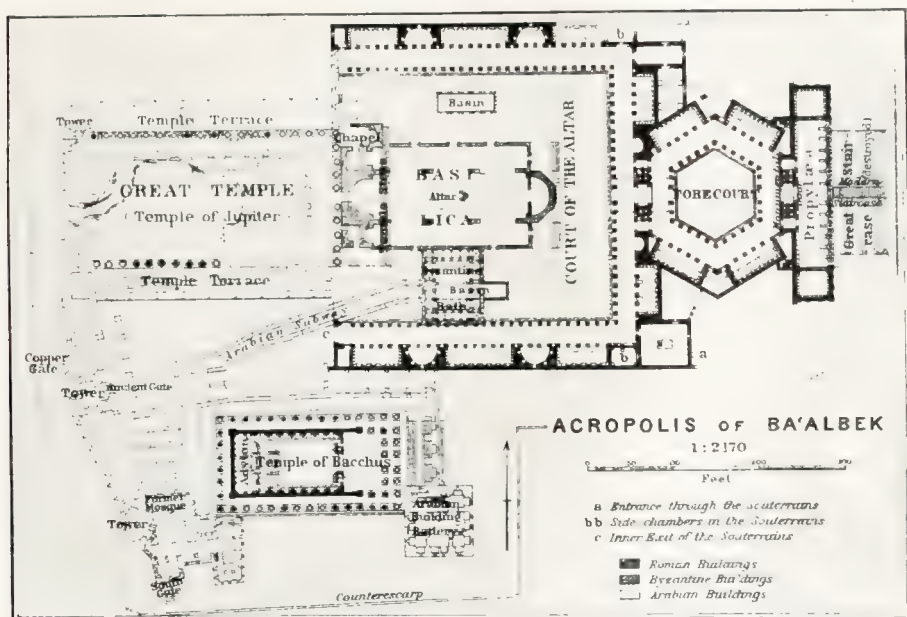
GROUND PLAN OF THE TEMPLE AREA
